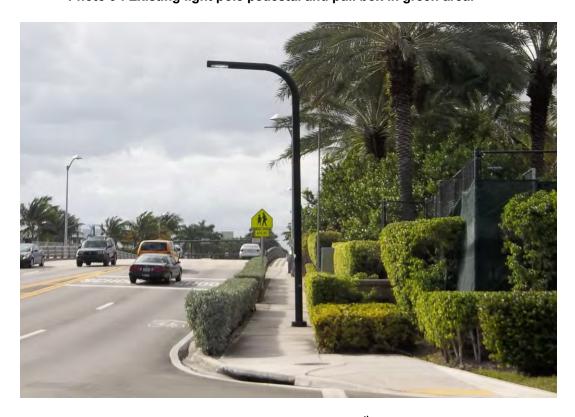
Existing light pole adjacent to the 96<sup>th</sup> Street bridge, looking west.
